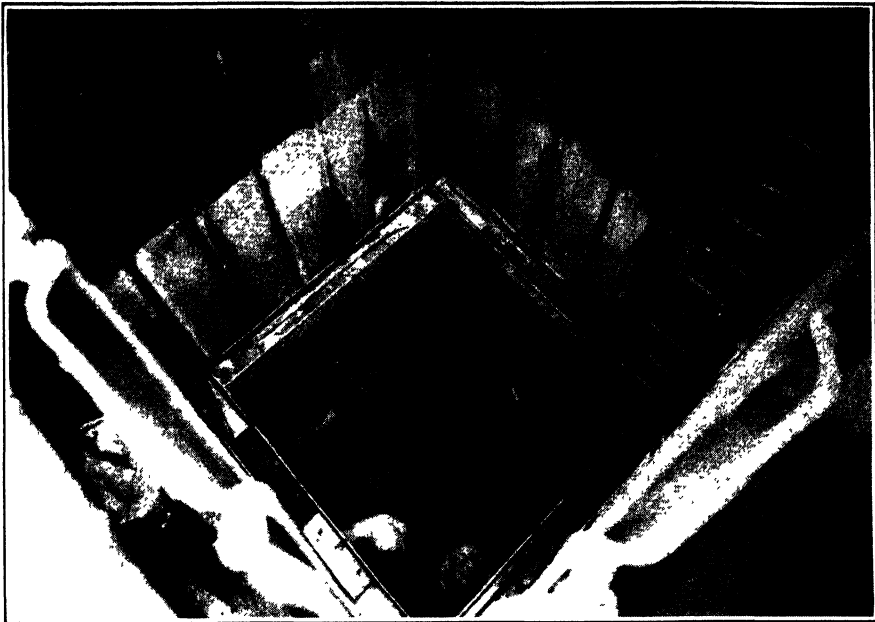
Looking down into excavation for a pier within a caisson formed by steel sheet piling driven down to rock. (Courtesy of Spencer, White and Prentis, Inc.)
